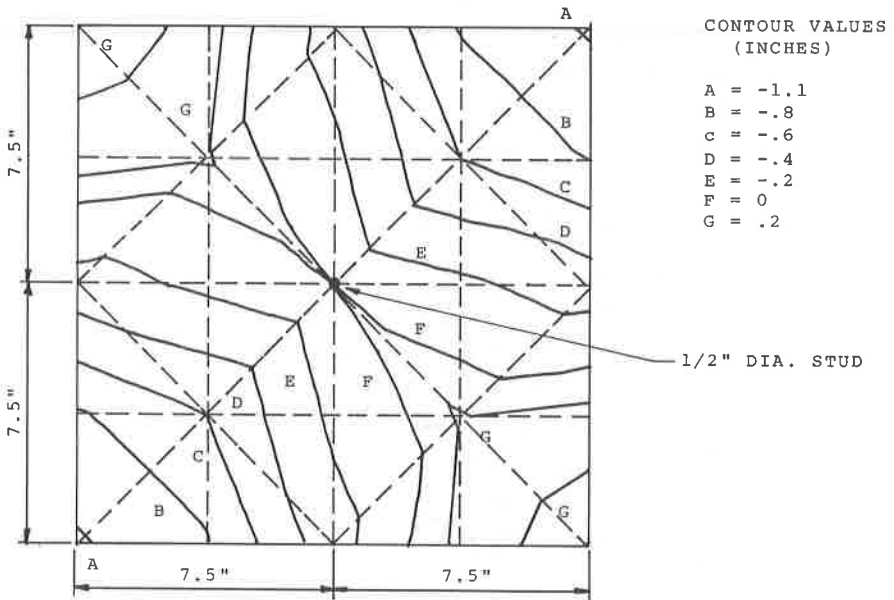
WALL LINER - CHECKERBOARD BUCKLING
